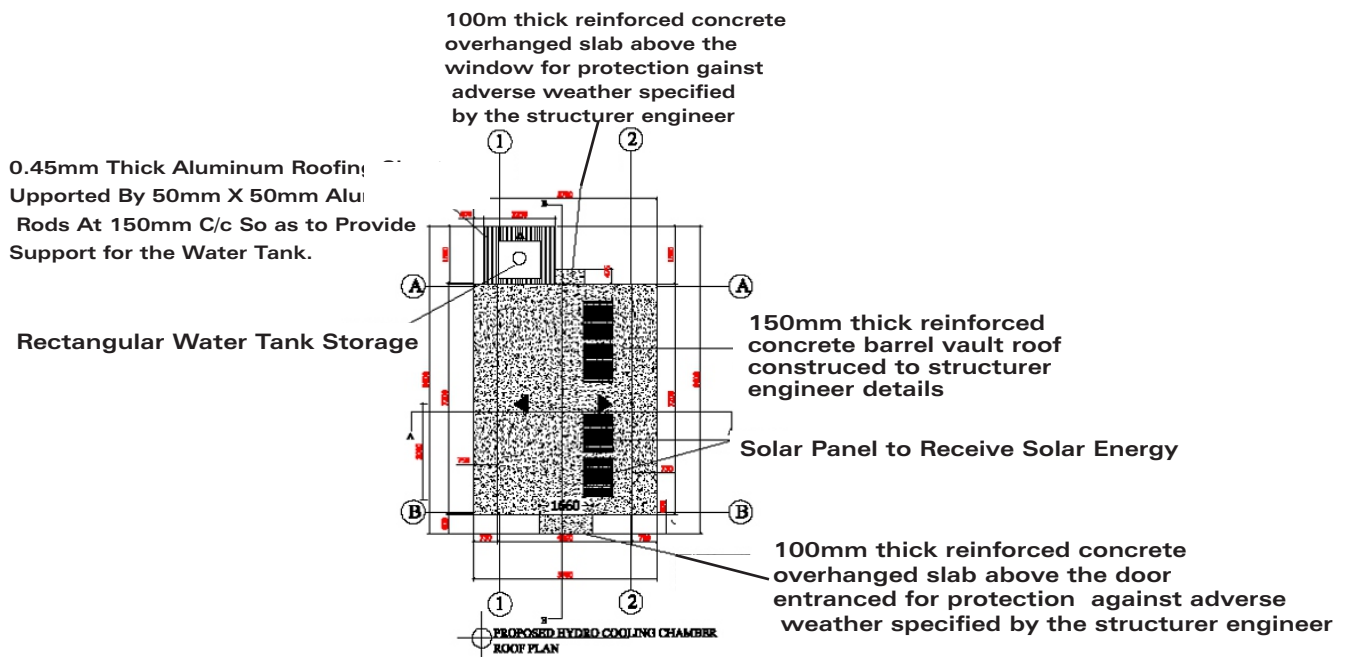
The Roof Plan of the Hydro-Cooling Chamber
